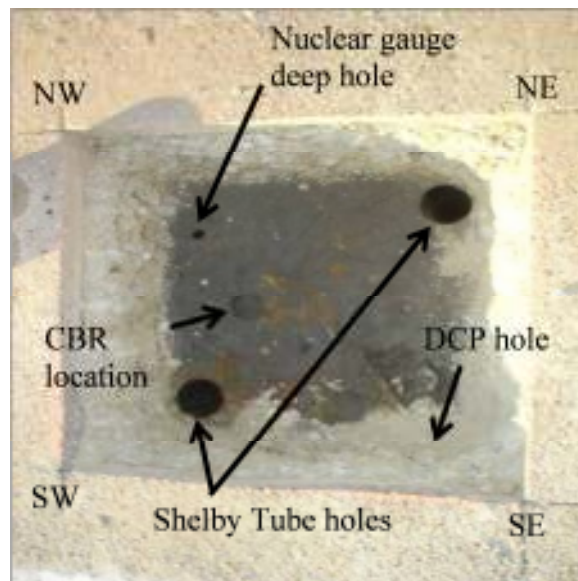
Typical location of DCP hole, deep hole (for nuclear gauge readings), and two holes created by obtaining Shelby tubes (Section).
